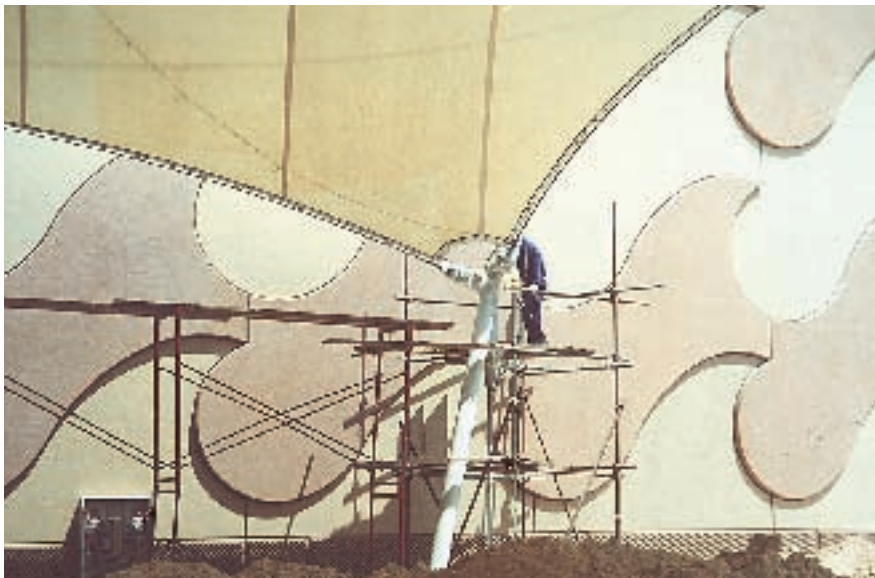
The north wall features panels cast with a wave pattern, which impacted the shape of the panels.
